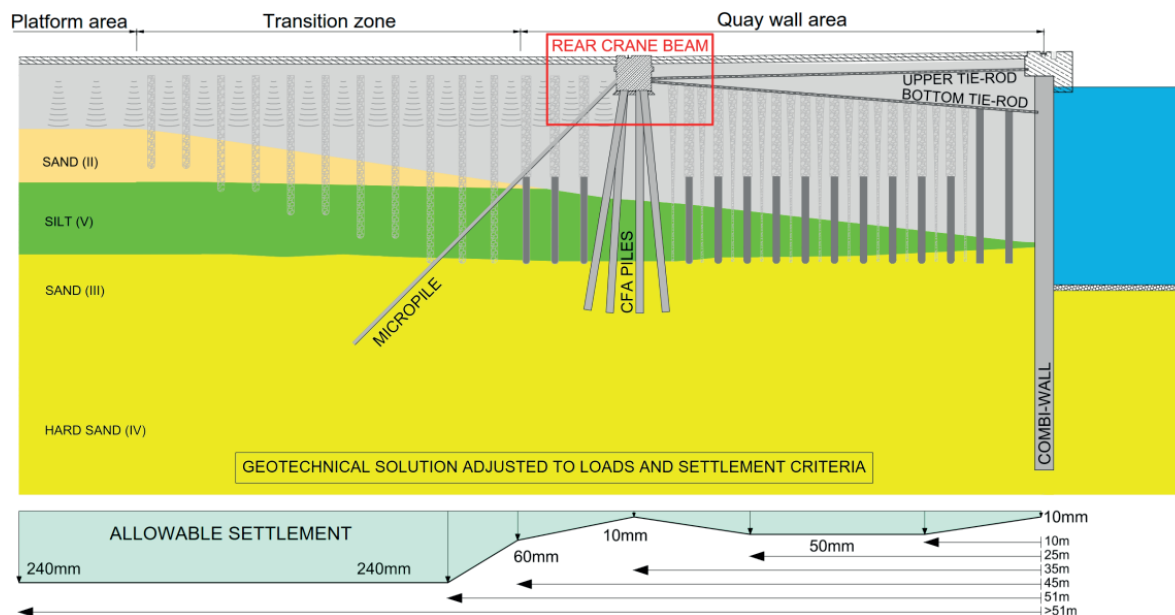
A typical cross-section of the quay wall in offshore part of the project
